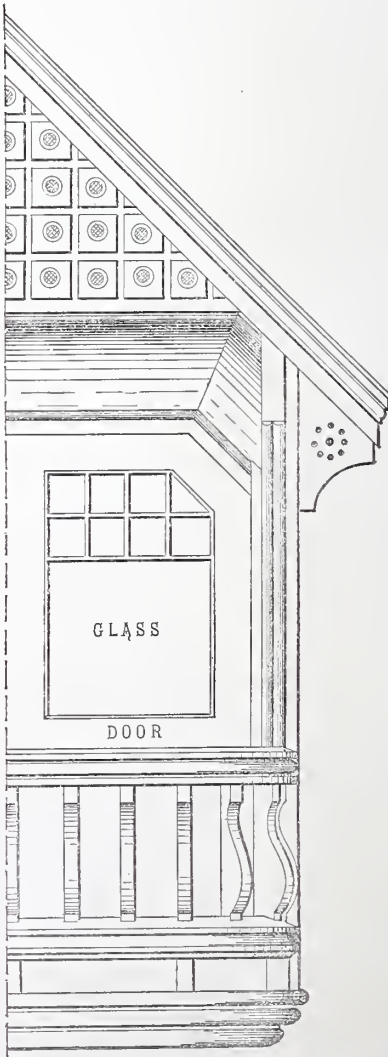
Half Front Elevation of Outlook, Main Roof.—Scale, 1/2 Inch to the Foot.
